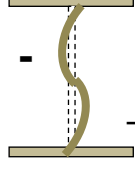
Imperfection of Fascia Girder at Location 32 (Span 14)
